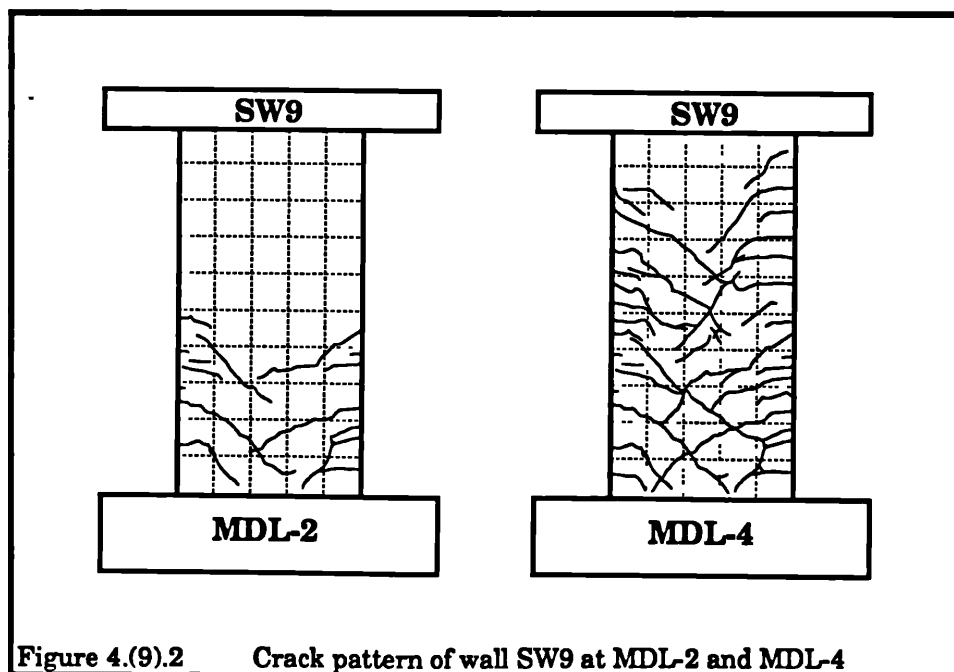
PilaSW9: DS1a - cracks at MDL-2 (peak after initial cracking) and MDL-4 (fully cracked)
